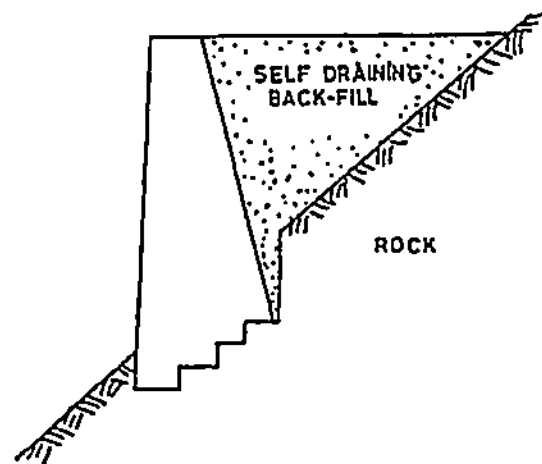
STEPPING OF FOUNDATION OF WALL ON ROCK SLOPE
